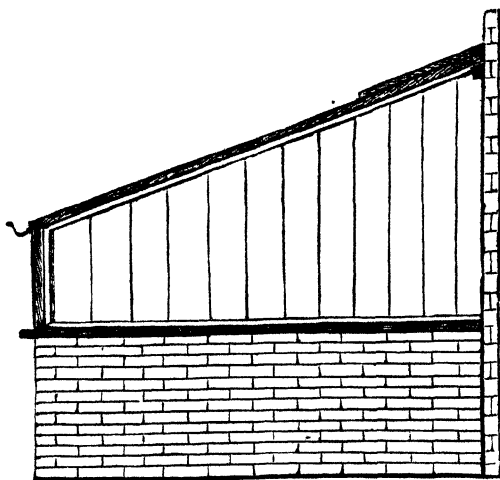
SIDE ELEVATION OF LEAN-TO.
